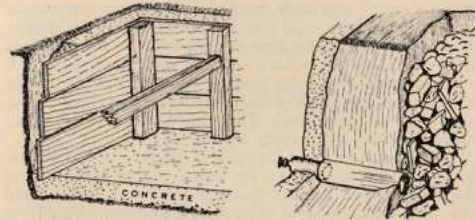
(Left) Wooden shuttering in position in one corner of the pond. (Right) Sectional view of a simple outlet for the pond made by cementing in a screw-topped bottle neck arranged to drain into a sump containing brick rubble.
